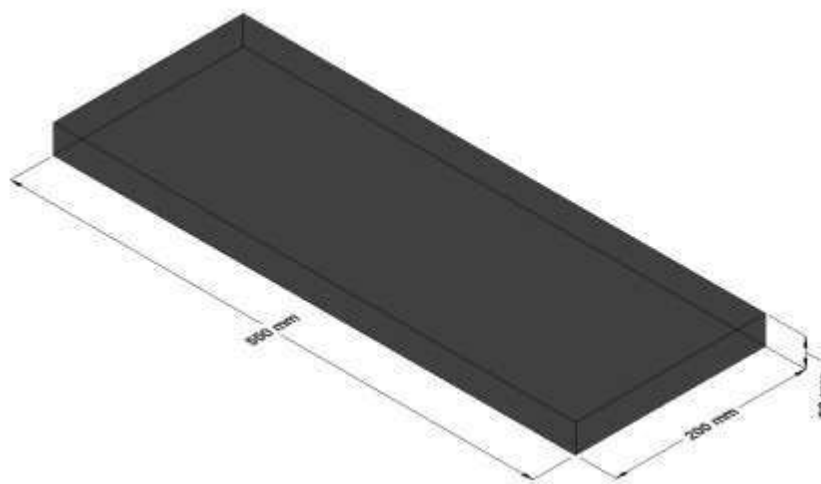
Dimension of panel (mm)- 550x200x30mm and 550x200x40mm
